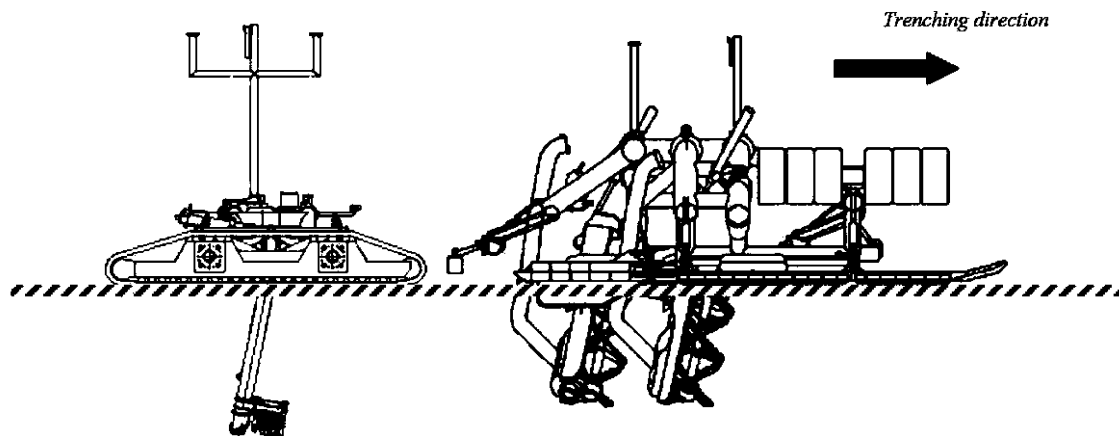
Post-trenching system developed by Saipem S.p.A.
